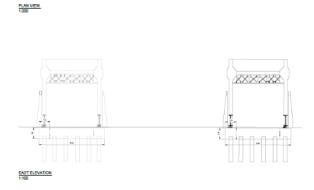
Cross Section of Relocated Scherzer Bridges
